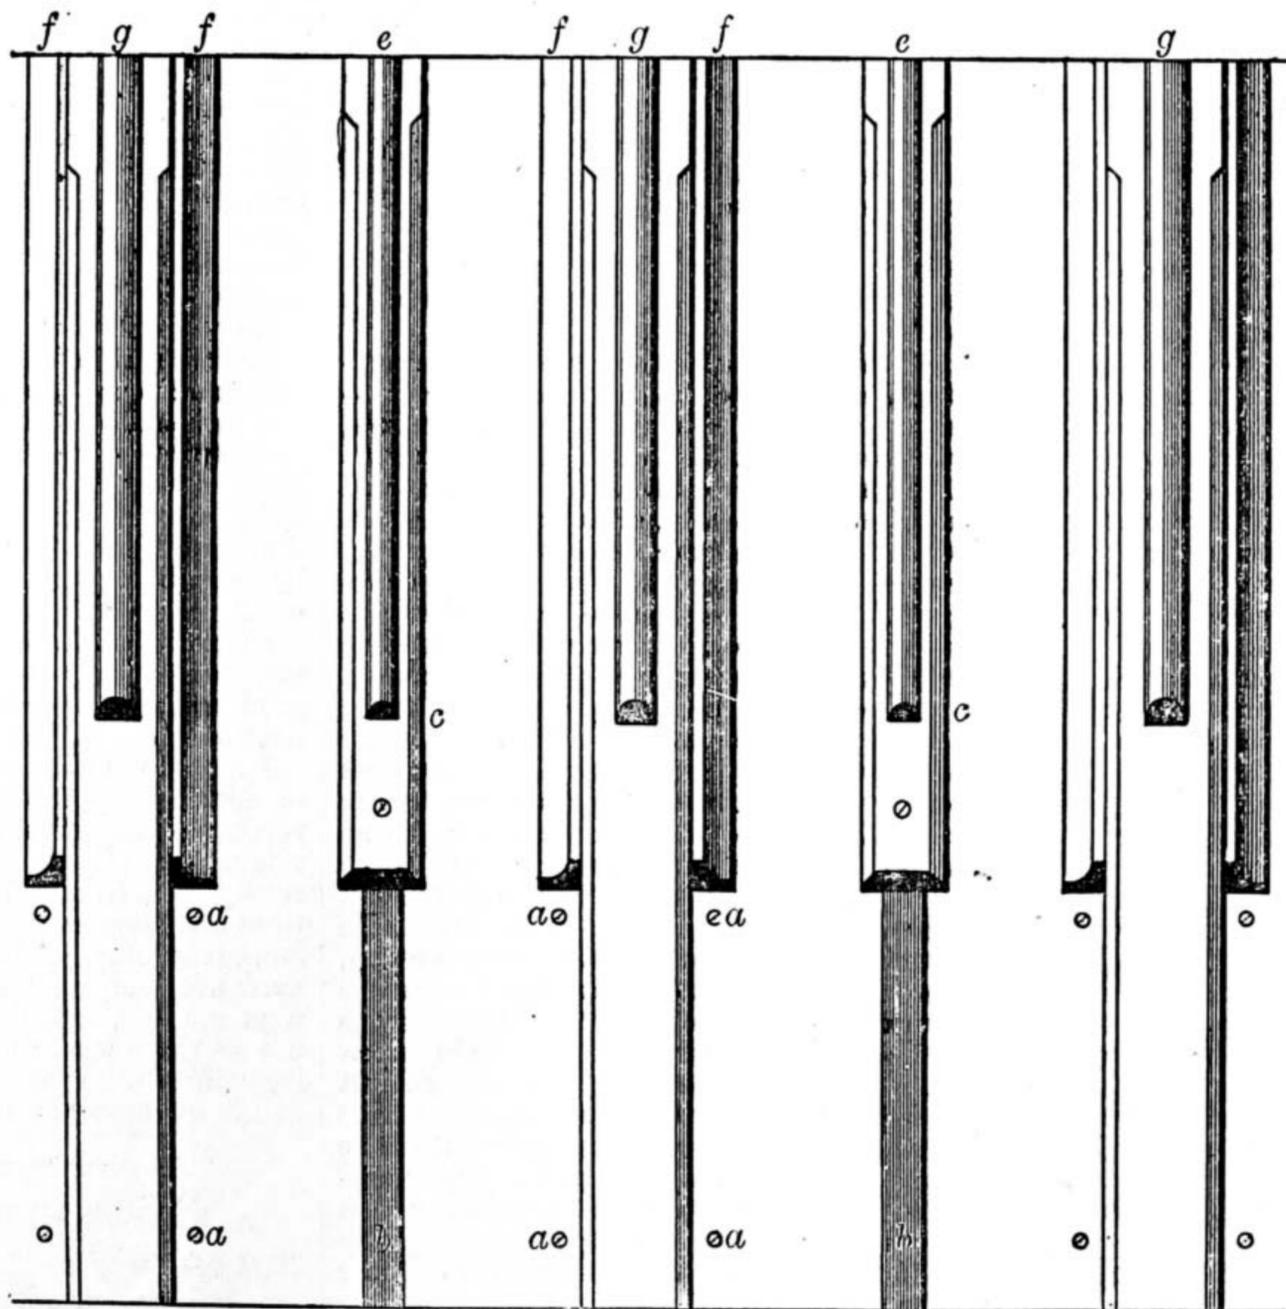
Wood Ceiling with Floor above, in Plan.
